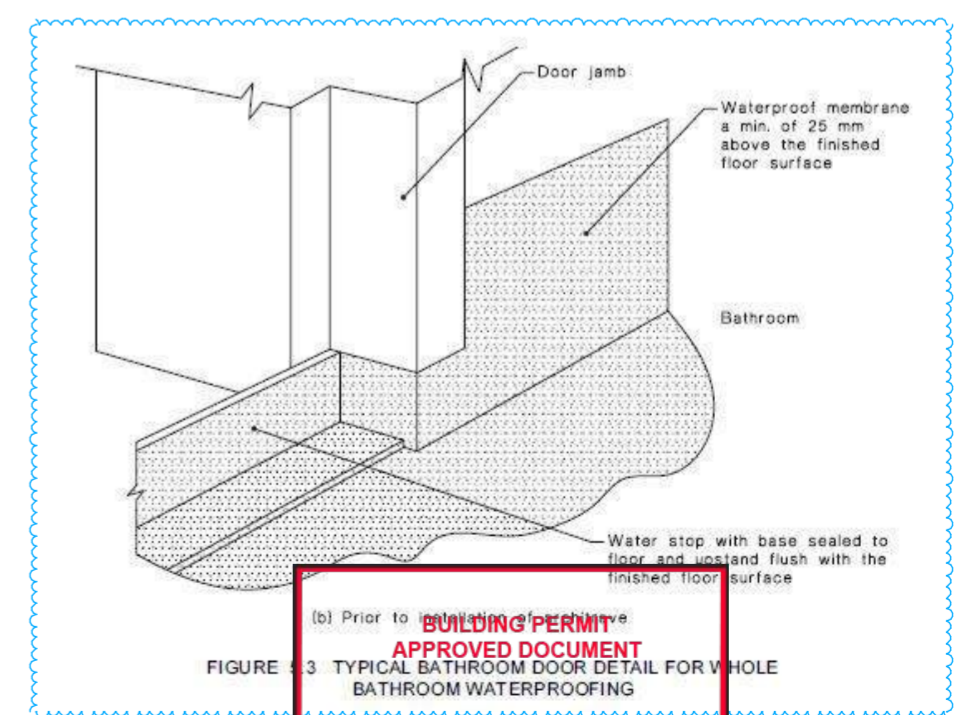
TYPICAL BATHROOM DOOR DETAIL FOR WHOLE BATHROOM WATERPROOFING
